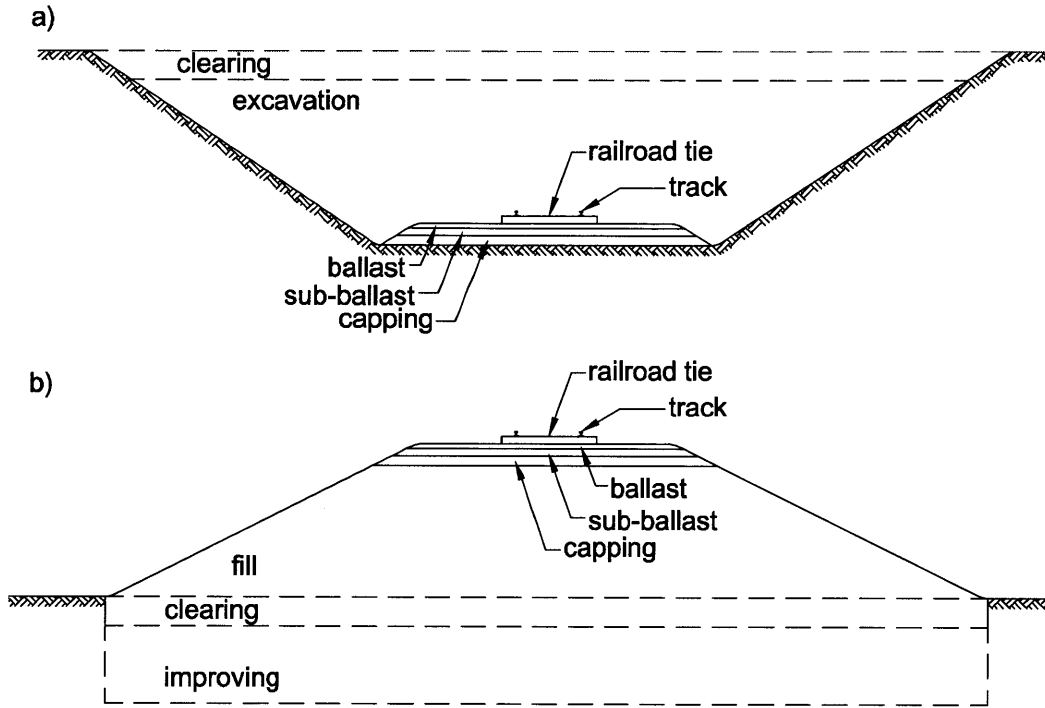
Cross-sections of a) a railroad cut and b) a railroad embankment. They show the construction processes: clearing the soil, placing the capping layer, placing the sub-ballast, the ballast, the railroad ties and the tracks are common processes, while excavating is a process in cut construction, and improving the in situ soil and filling the embankment are processes in embankment construction.
